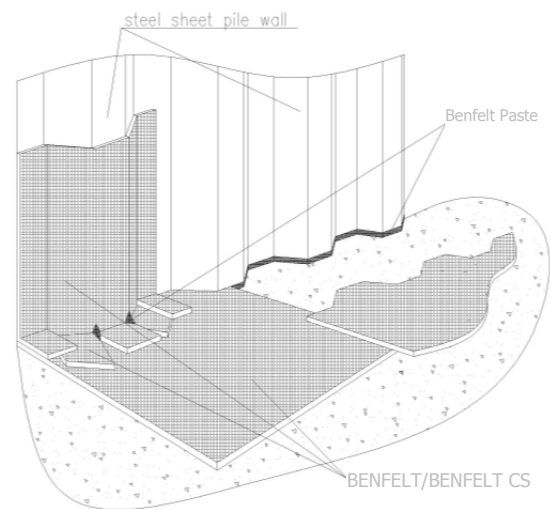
Connection of the horizontal and vertical insulation set on sheet piles.
